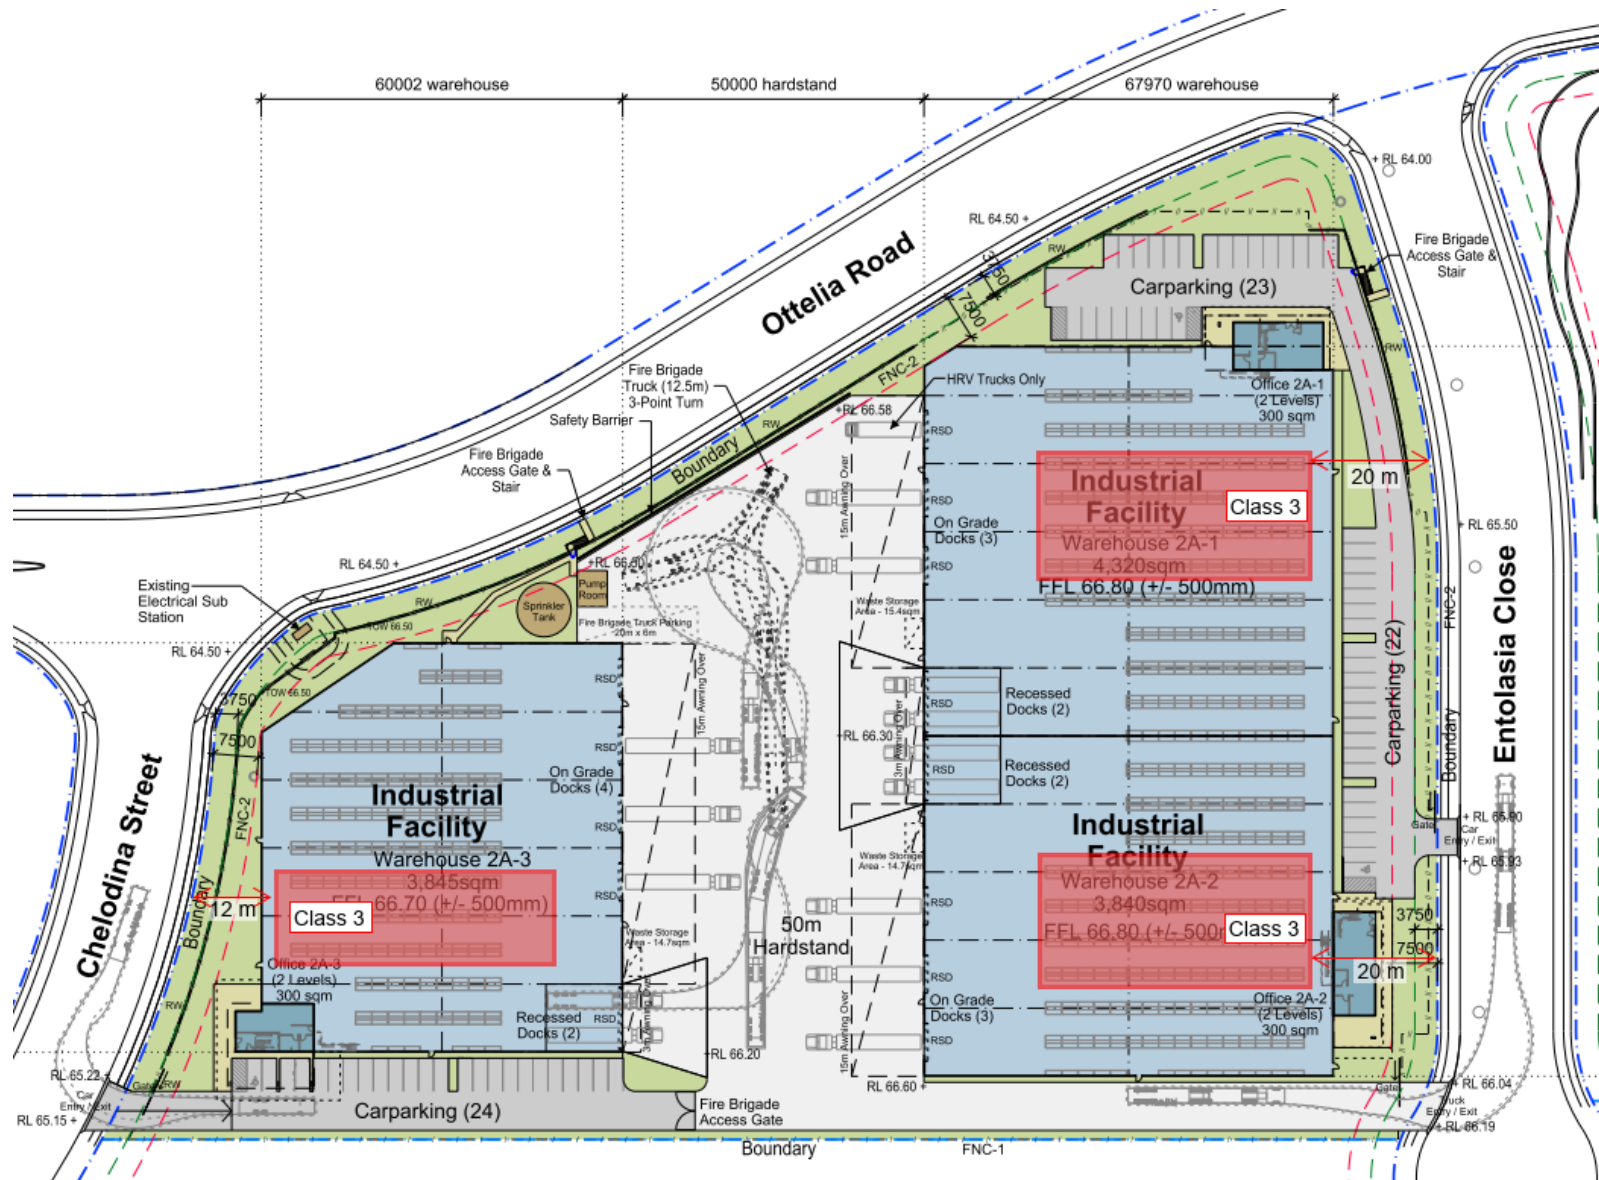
Lot 2A Oakdale South Estate Site Layout
